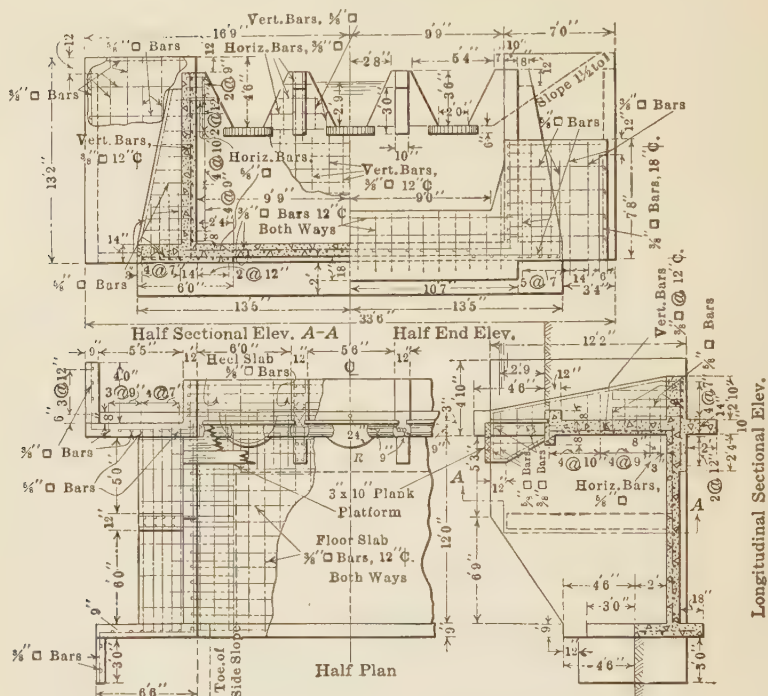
Reinforced concrete notch drop. Mora Canal, Boise Project, Idaho.
